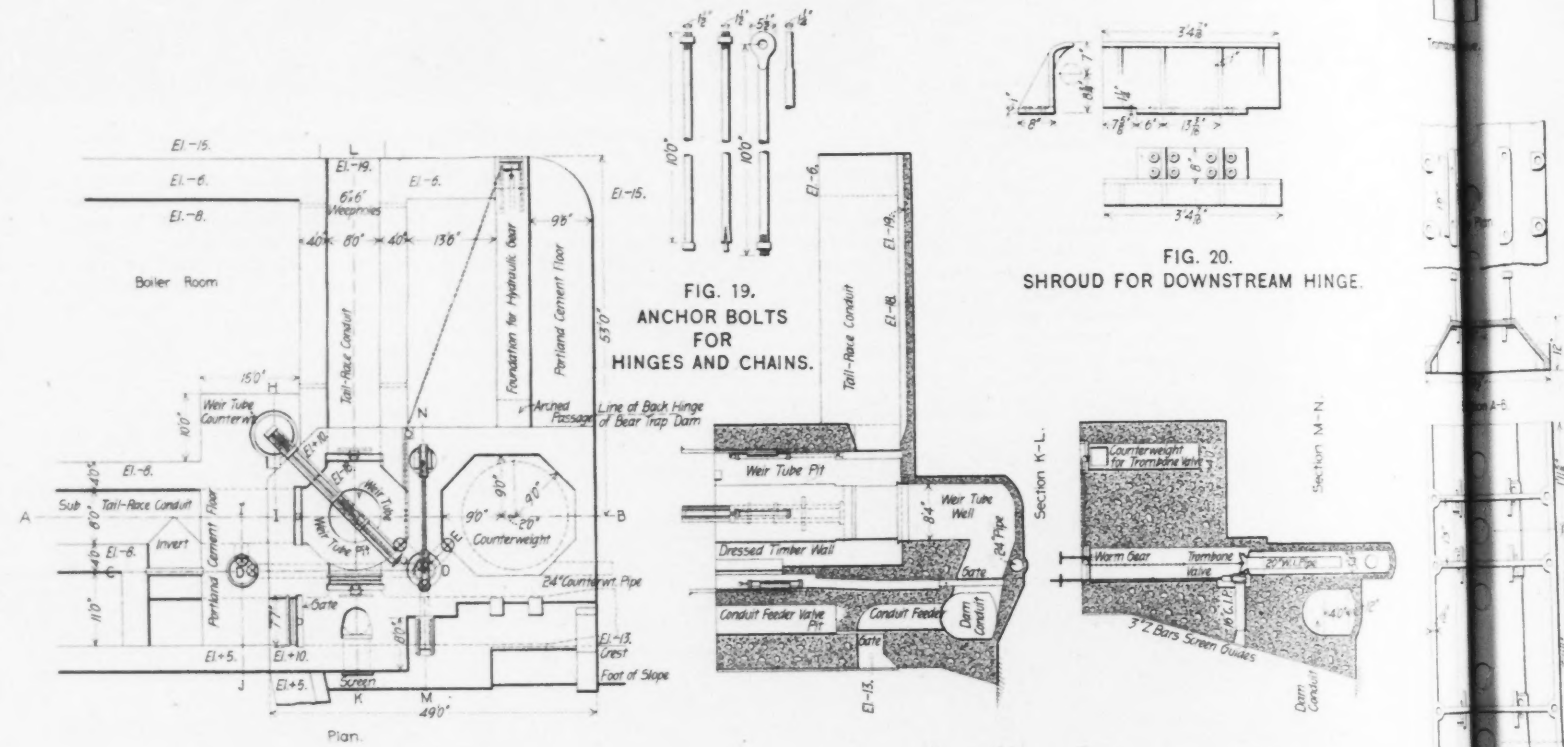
PLAN AND DETAILED SECTIONS SHOWING WELL AND CONDUIT CONSTRUCTION.
